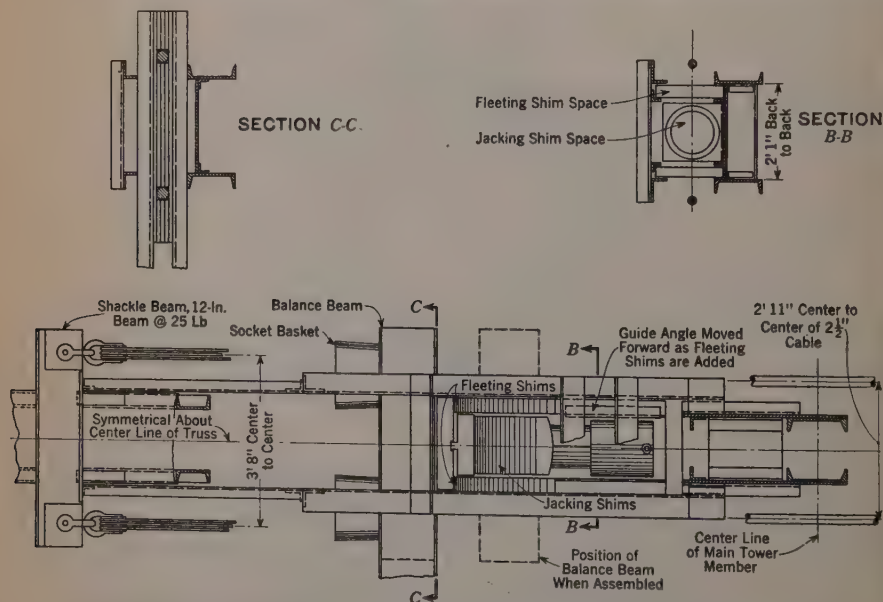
PLAN OF JACKING DEVICE, SHOWING PART PLAN OF FALLS USED TO STRETCH THE CABLES INTO PLACE
